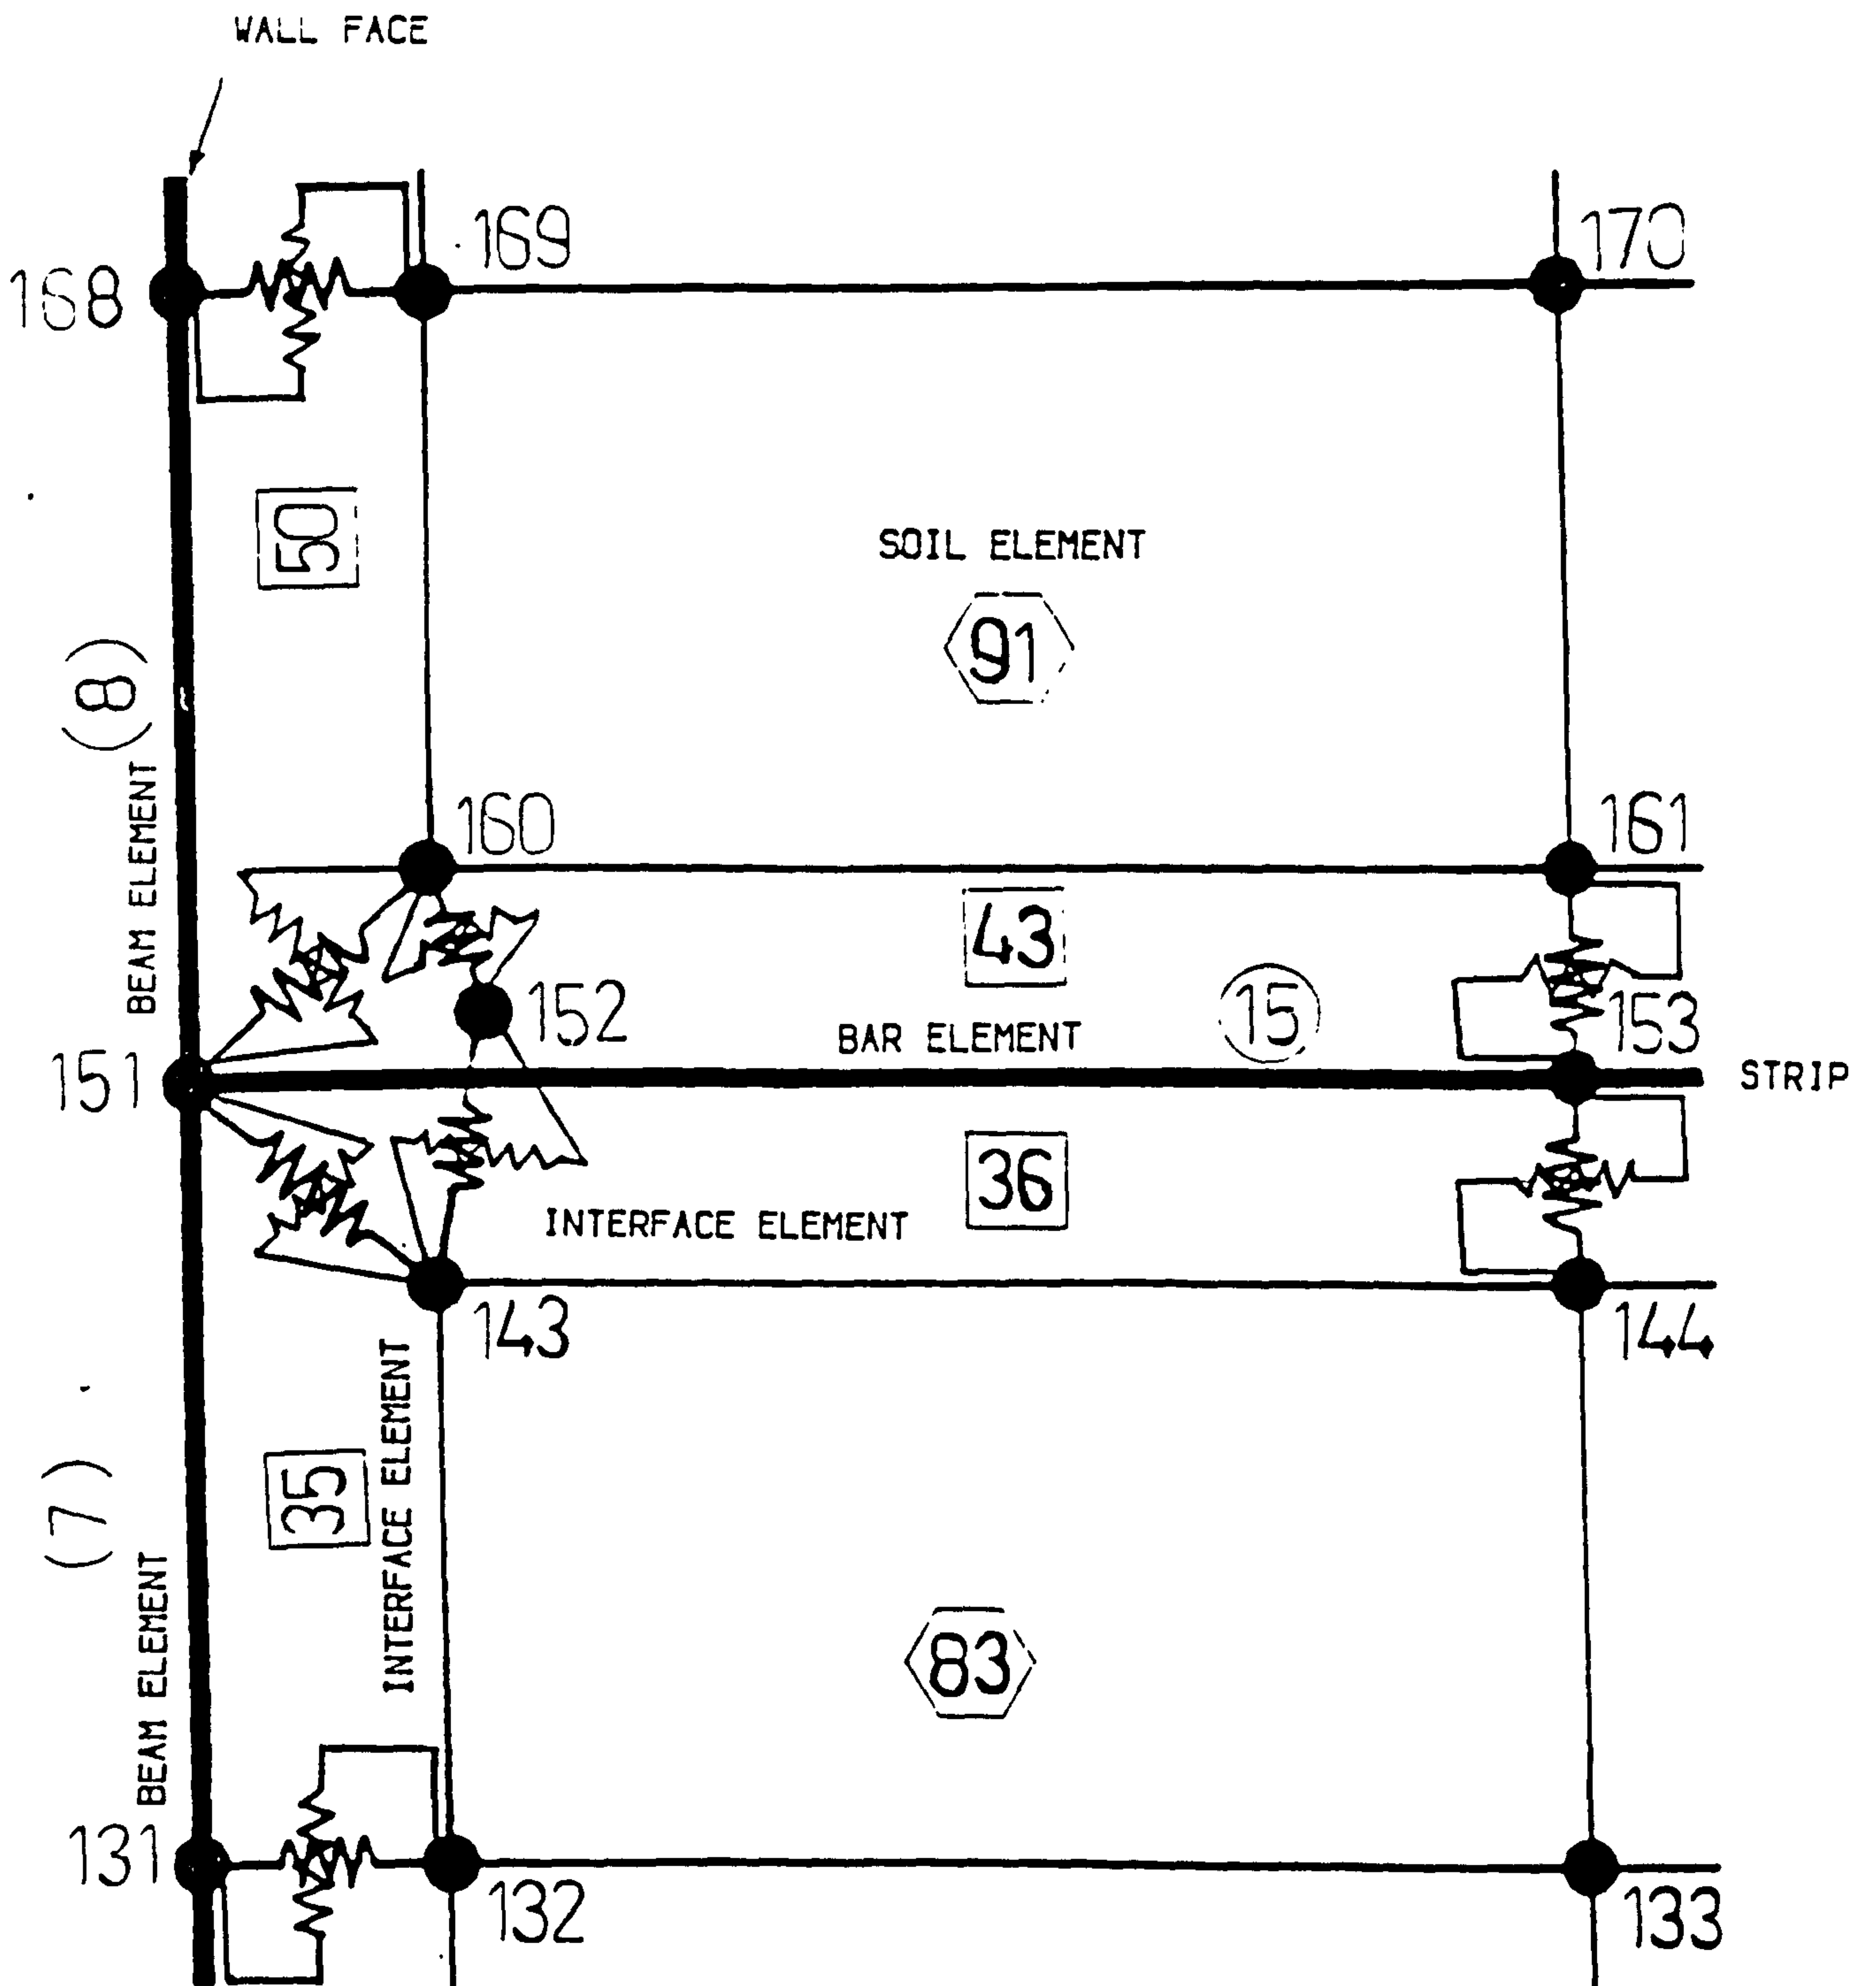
DETAIL (A) REINFORCEMENT / WALL CONNECTION.
